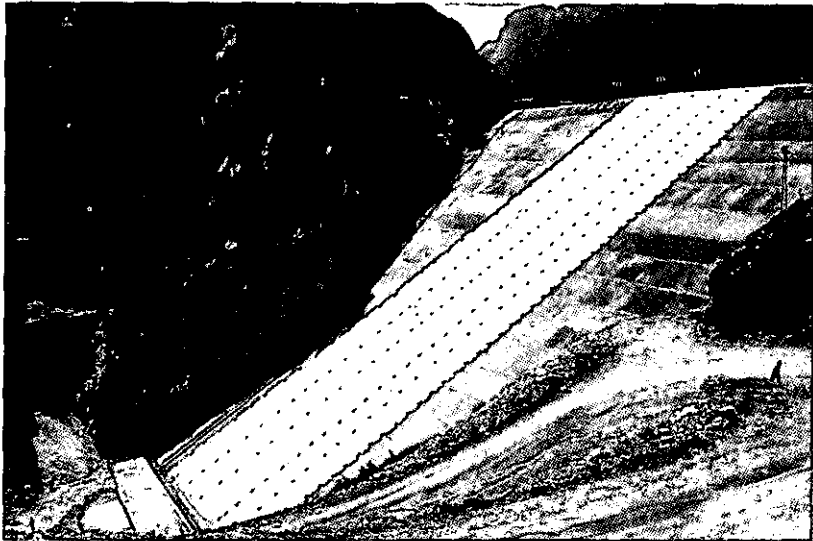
The waterproofing PVC sheets installed on the 91 m high Bovilla earth dam and afterwards covered by concrete slabs
